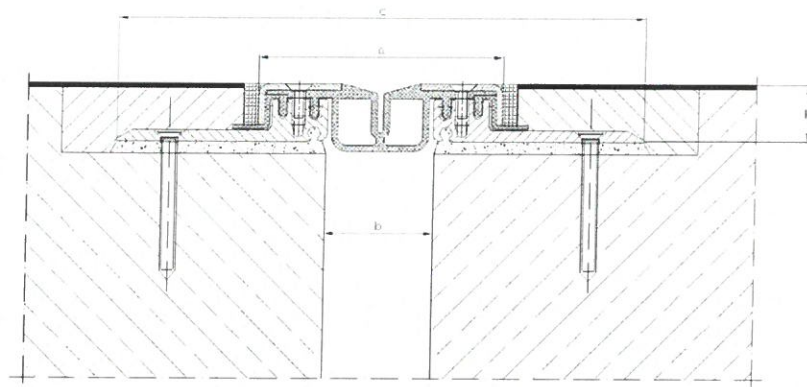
CONECTO PARK GA 50.20.90& S waterproof expansion joint profile
